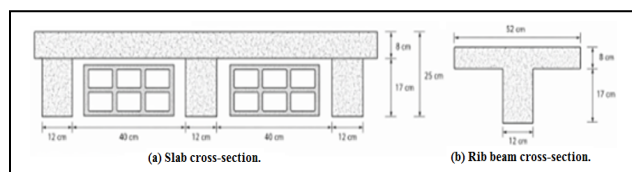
Rib slab details: (a) Slab cross-section; (b) Rib beam cross-section.
